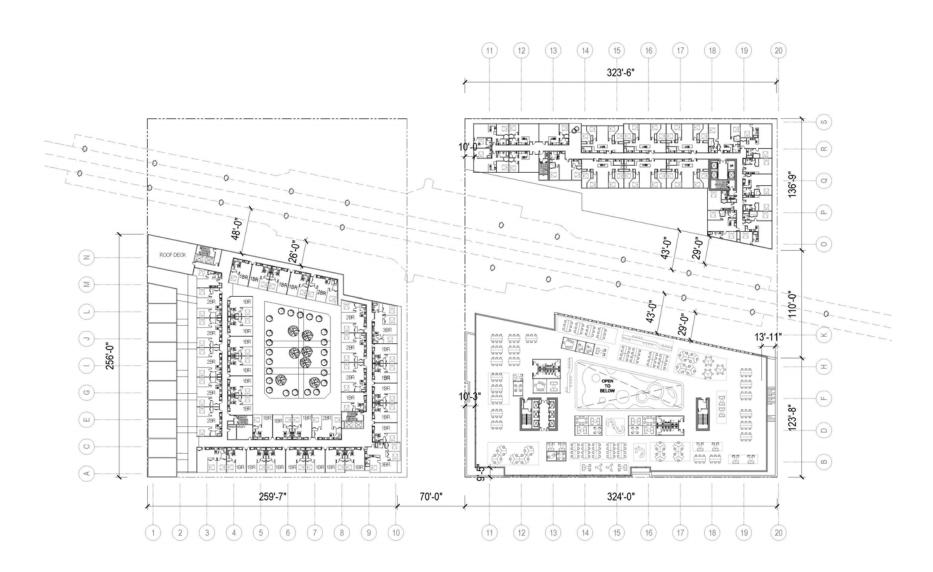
Floor Plan, 6<sup>th</sup> Floor
